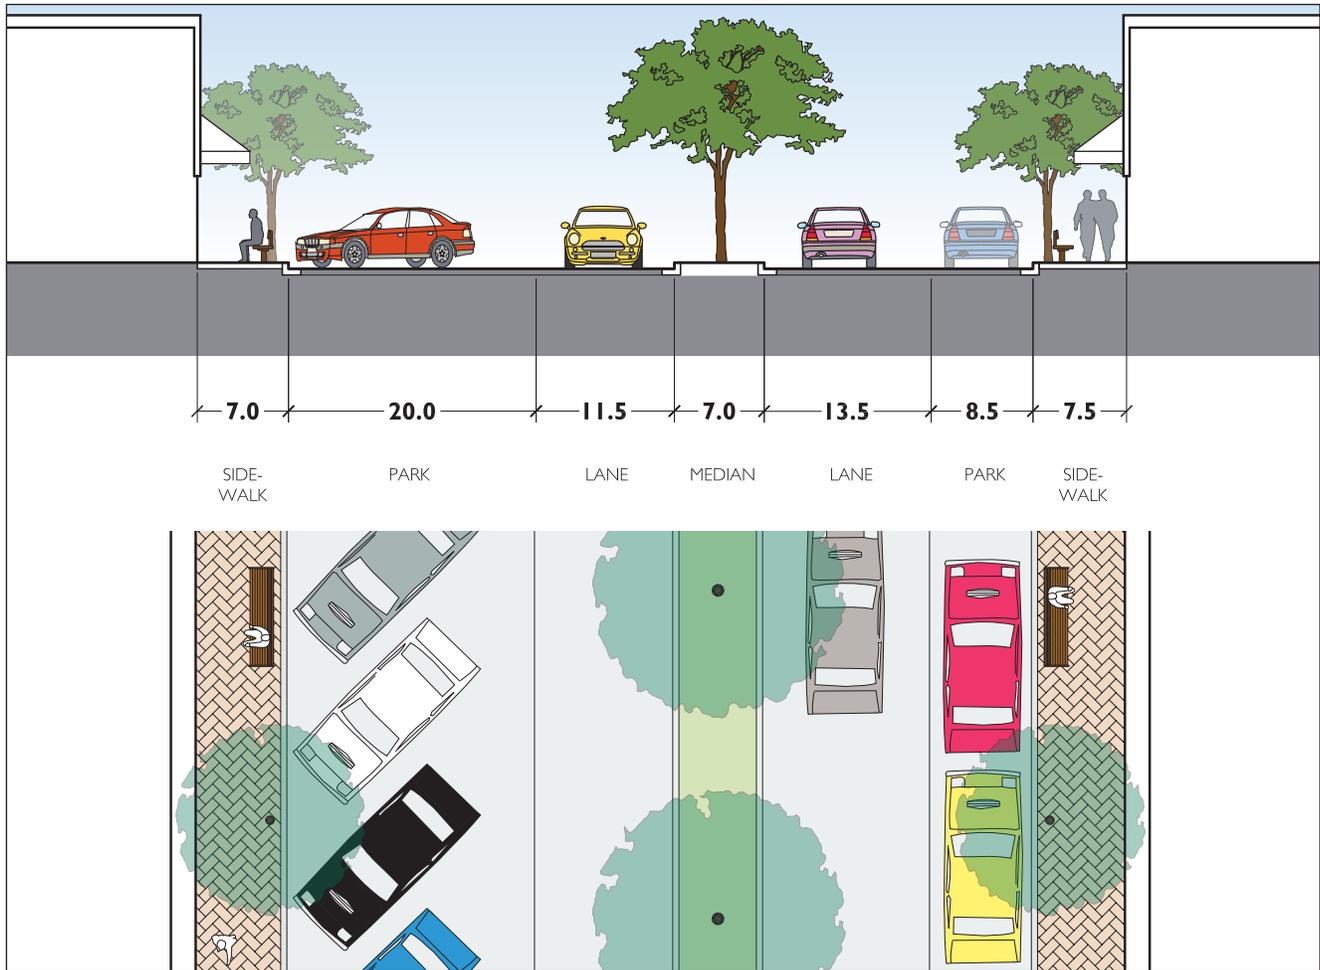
Existing Santa Cruz Avenue Street Cross-Section and Plan.
